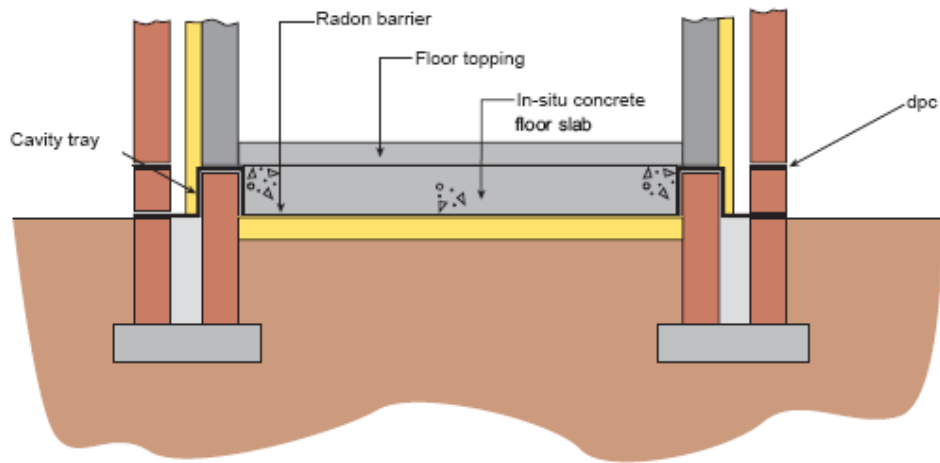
Enhanced damp-proof membrane providing basic radon protection to a suspended concrete floor
